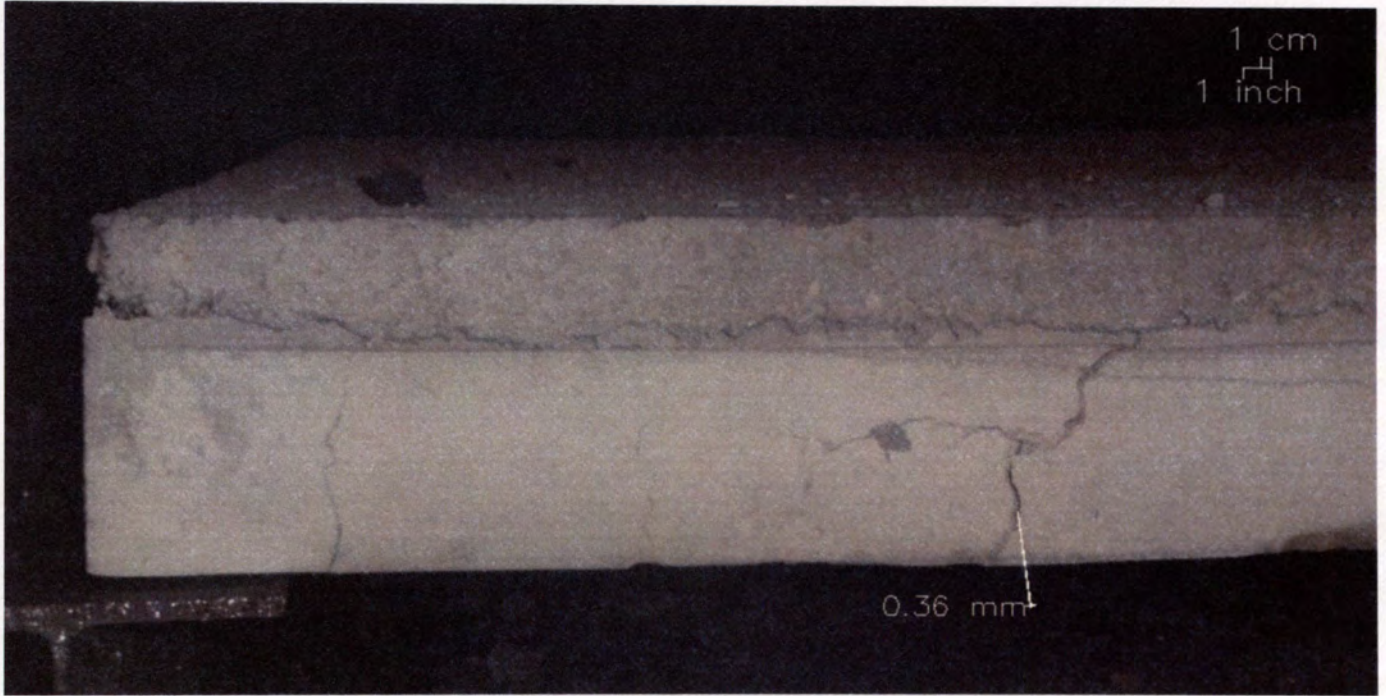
Flexural Cracks in the Front Face of 1-H, 1st Event
